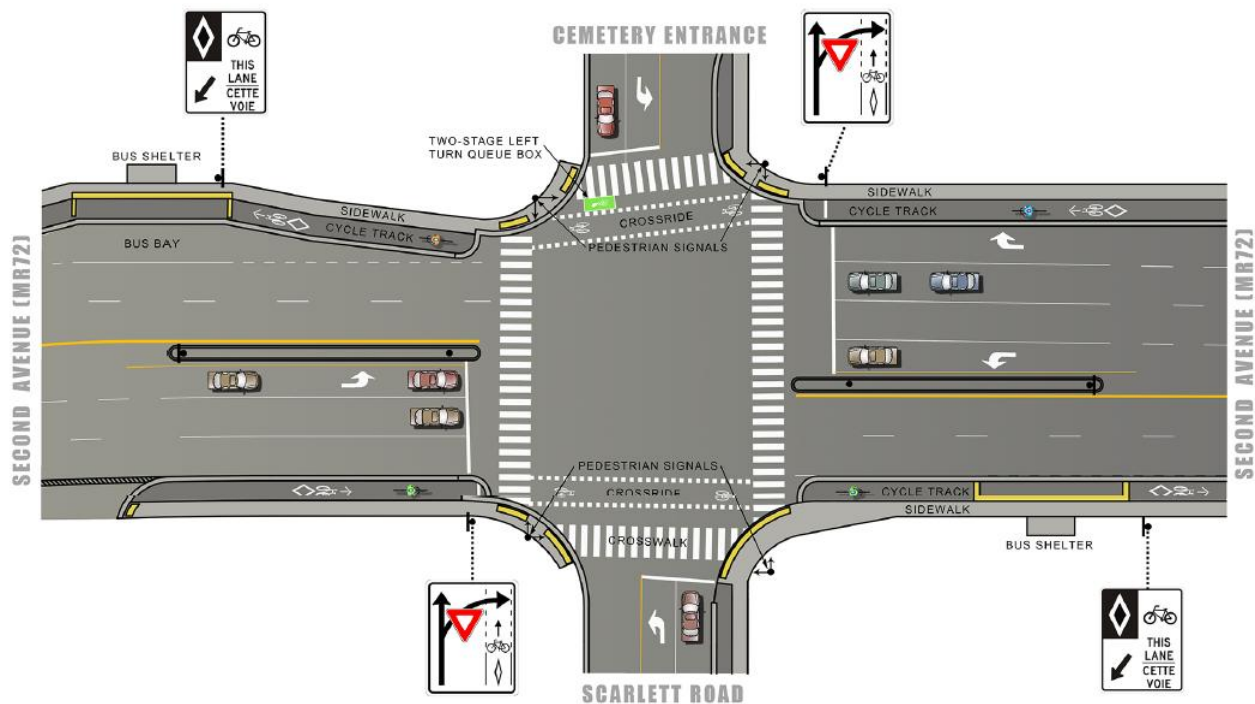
Illustration of new cycling infrastructure at Second Avenue and Scarlett Road Intersection
